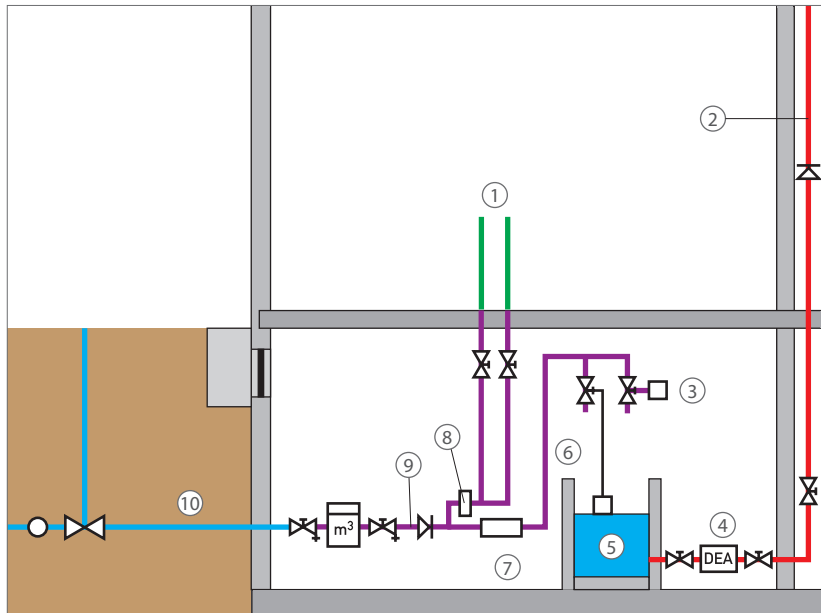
Extinguishing water transfer point with direct connection to the potable water installation
